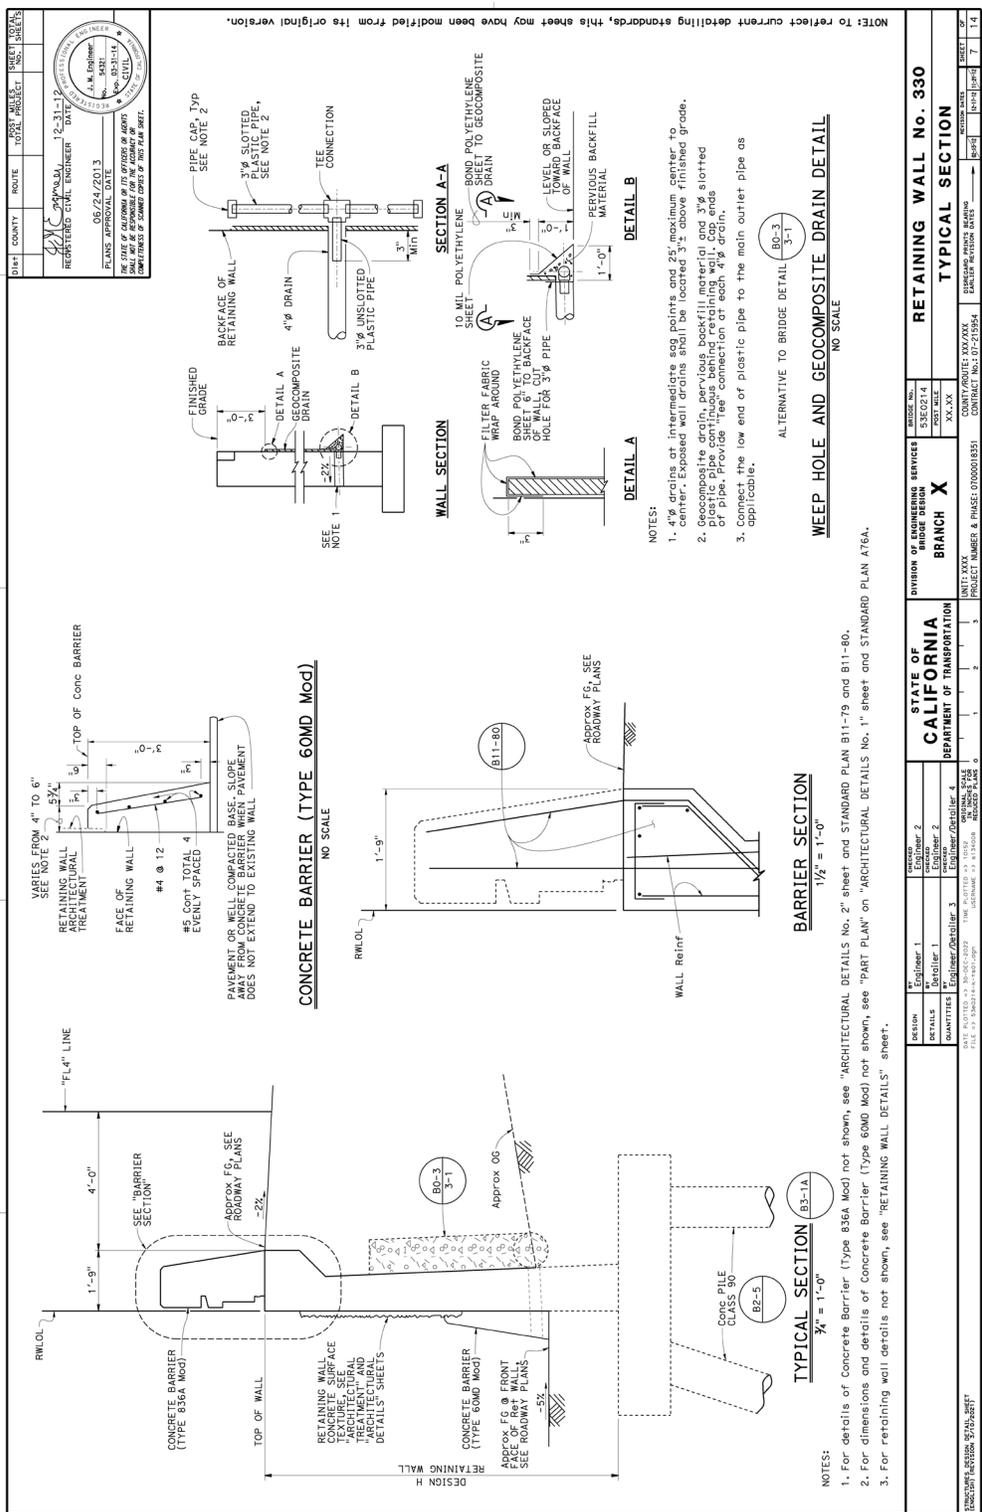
A.B.2 Modified Standard Retaining Wall (Type 1) Detailing Example 2
